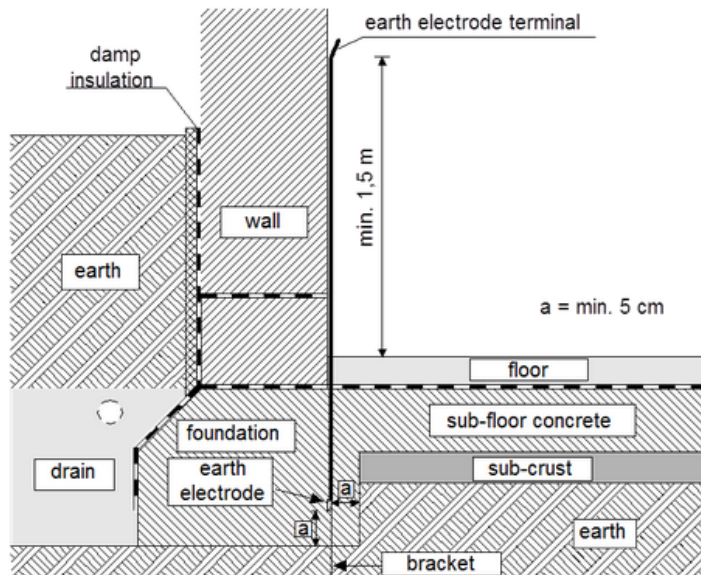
Illustration of the placement of the foundation earth electrode in foundation without concrete reinforcement.
